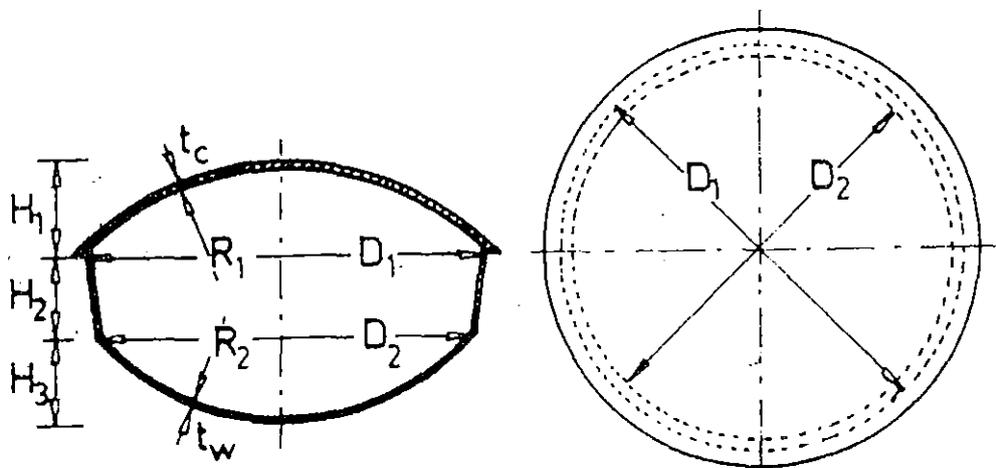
The Shape of a Concrete Dome Biogas Plant
